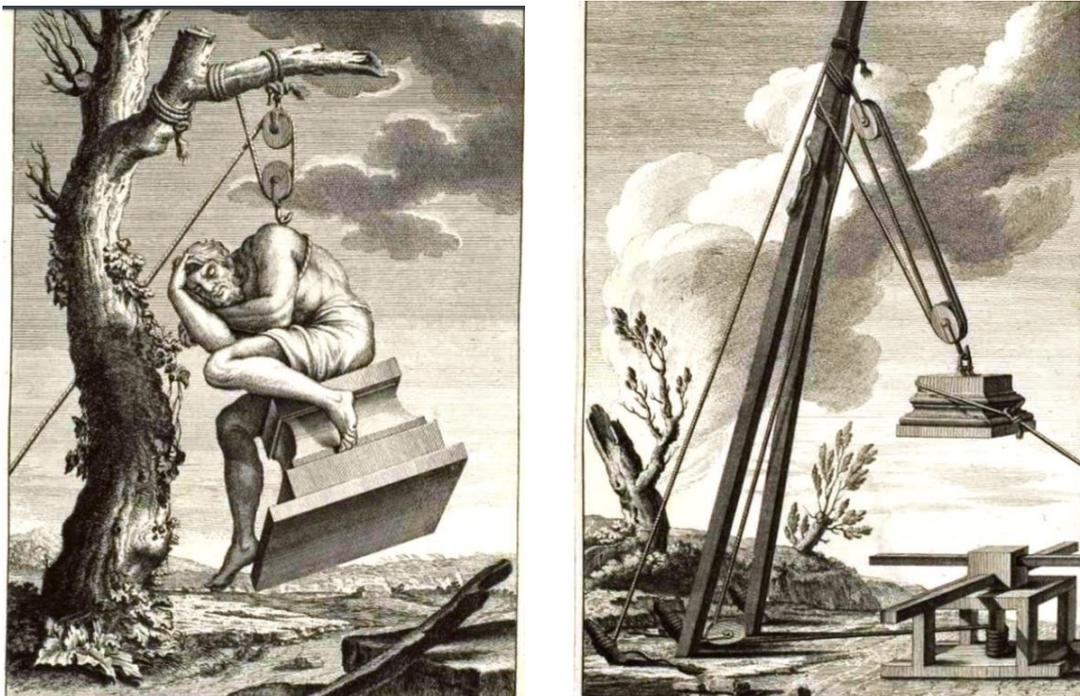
Drawing examples of pulleys and weight lifting devices
